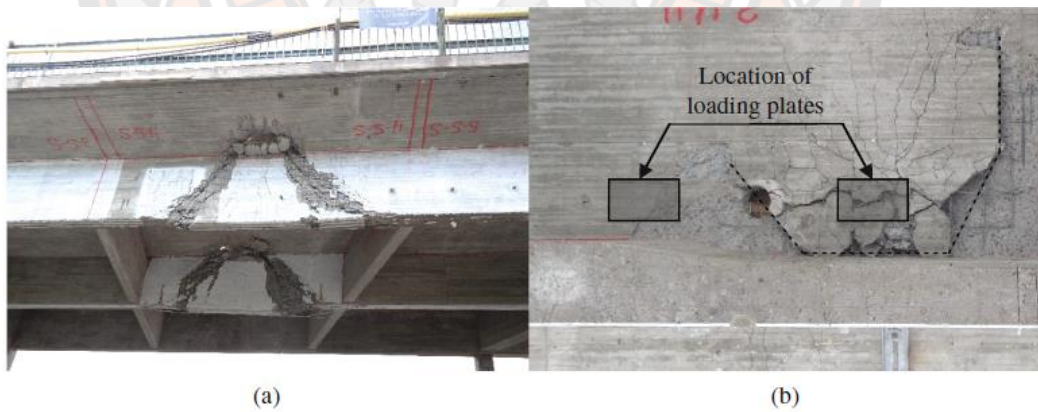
Photograph of the Kiruna Bridge after test: (a) failure of the girders, view from south, and (b) failure of the slab, view from underneath [36]
